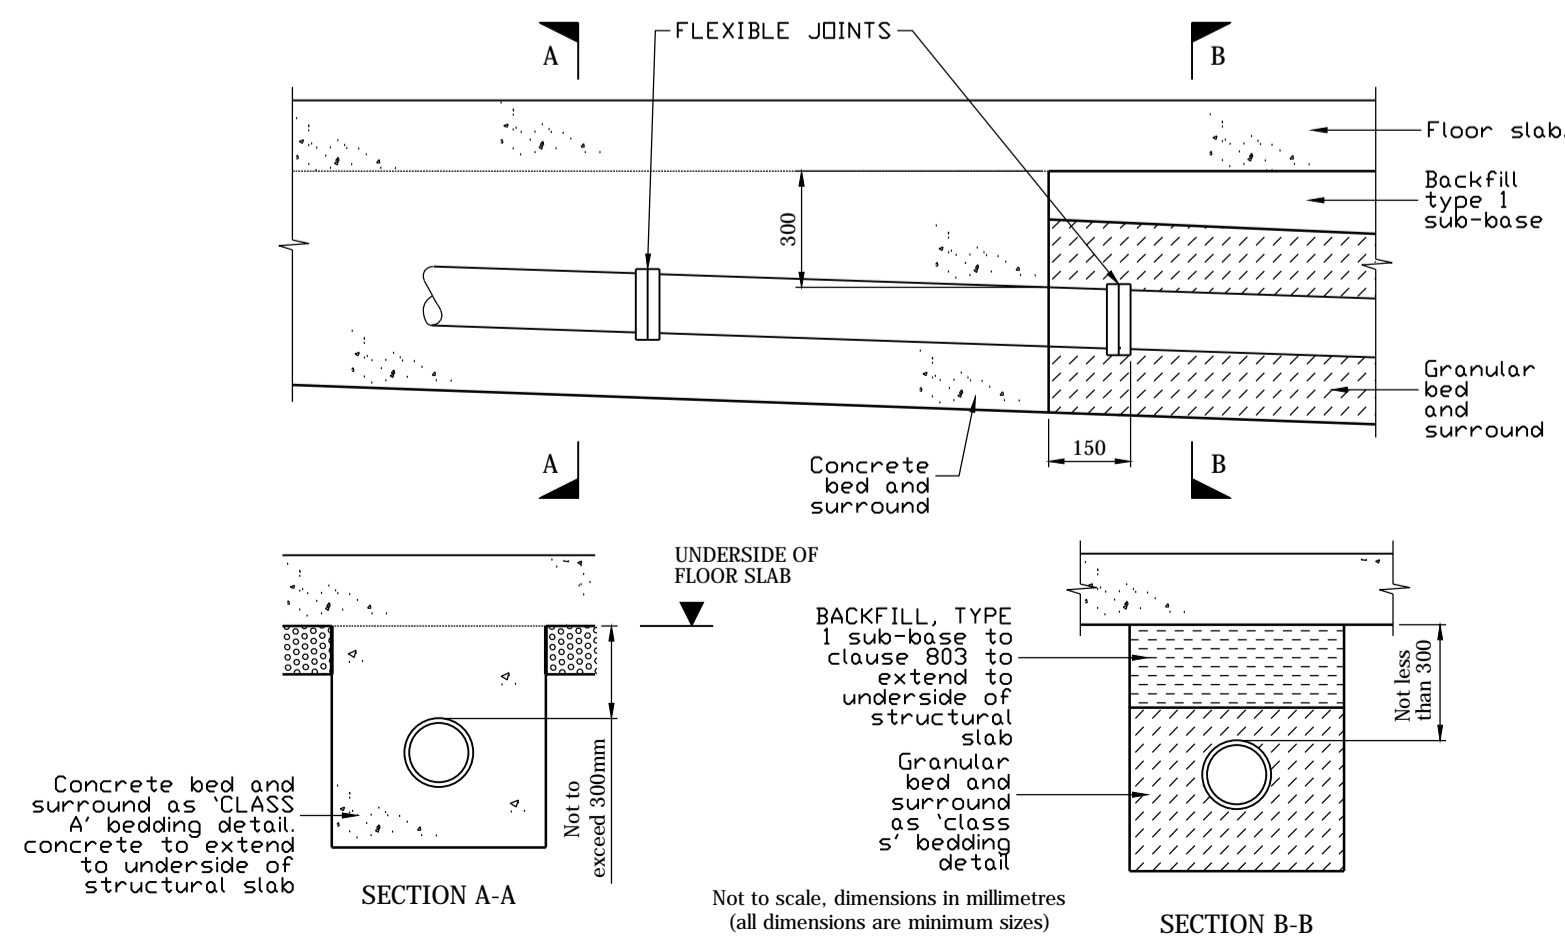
JOINTS FOR CONCRETE ENCASED PIPES
